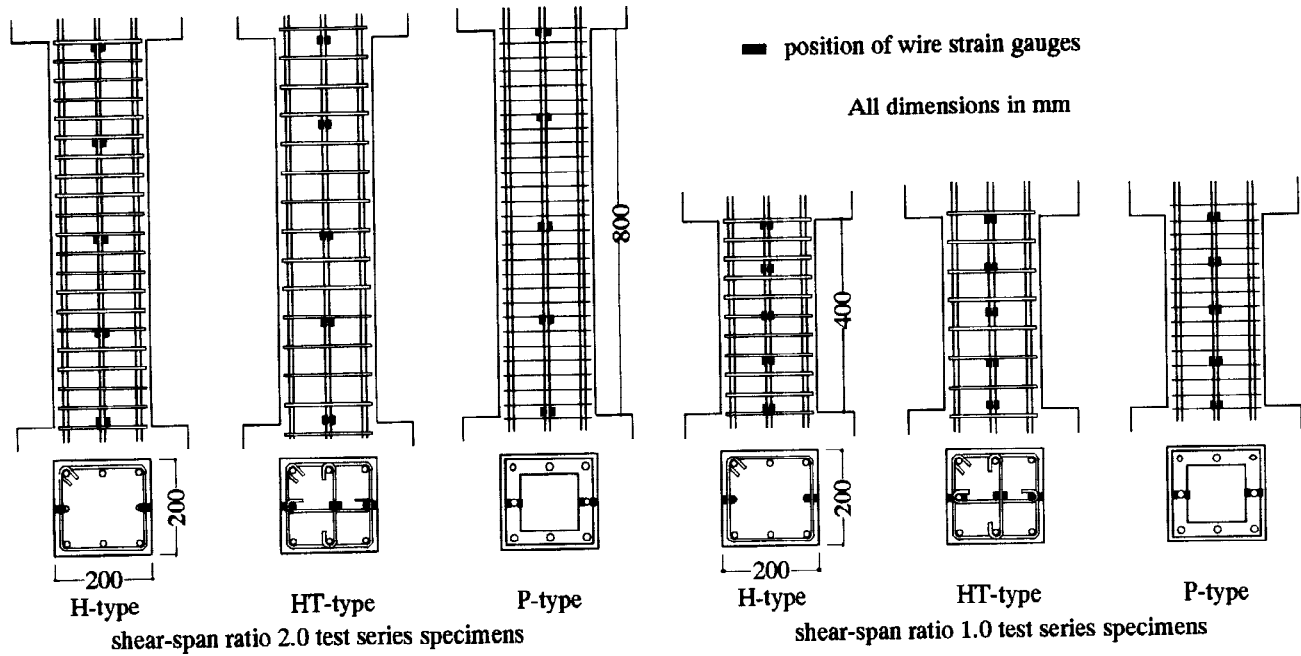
Nominal dimensions of test specimens, arrangement of reinforcement and position of gauges
